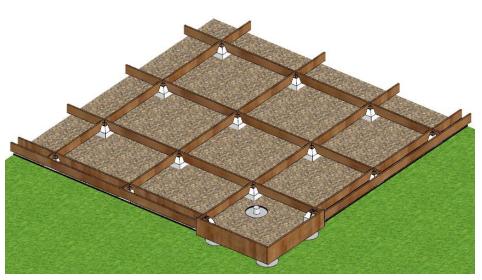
3D sketch showing the connection reinforcement of the inner beams
